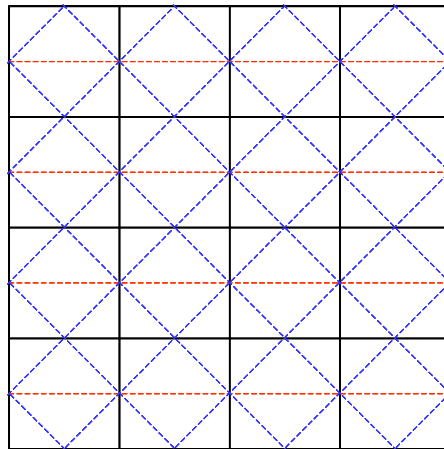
Sawing pattern to create shattered slabs in the existing pavement..
